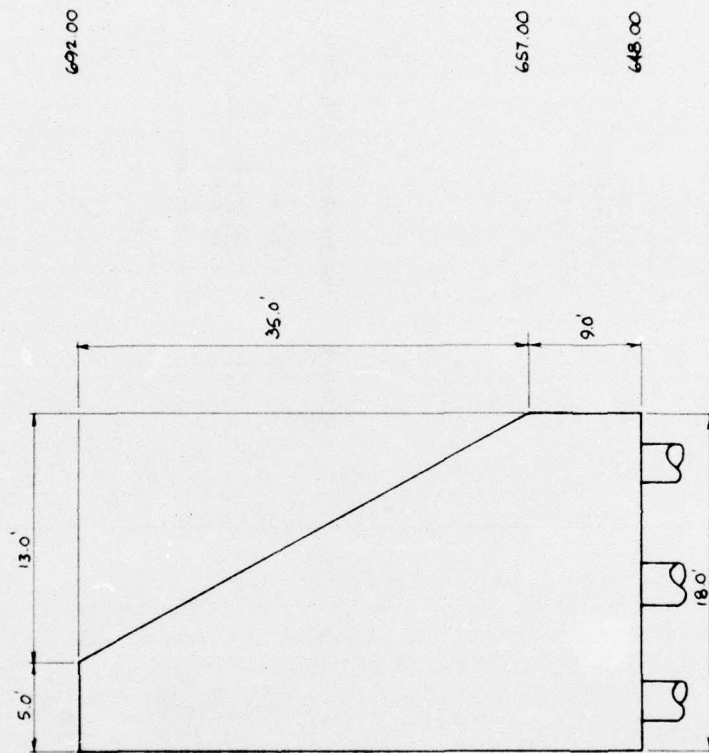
RIVER WALL - LOWER GUARD WALL MONOLITH R-29
